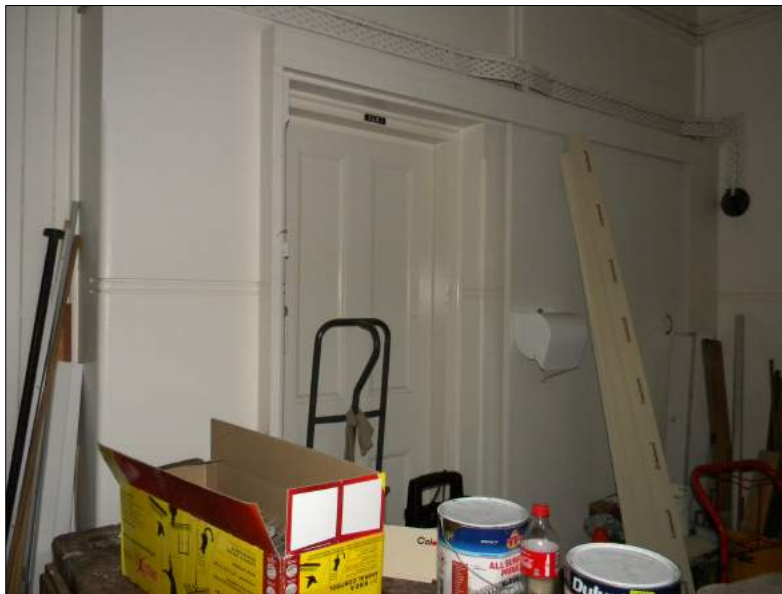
Eastern end of the hallway, Room 309 in the *CMP 2016*. The staircase to ground floor level lies behind the sliding door (*CMP 2016* Room 315). The adjoining door leads into Room 314, a storeroom.
